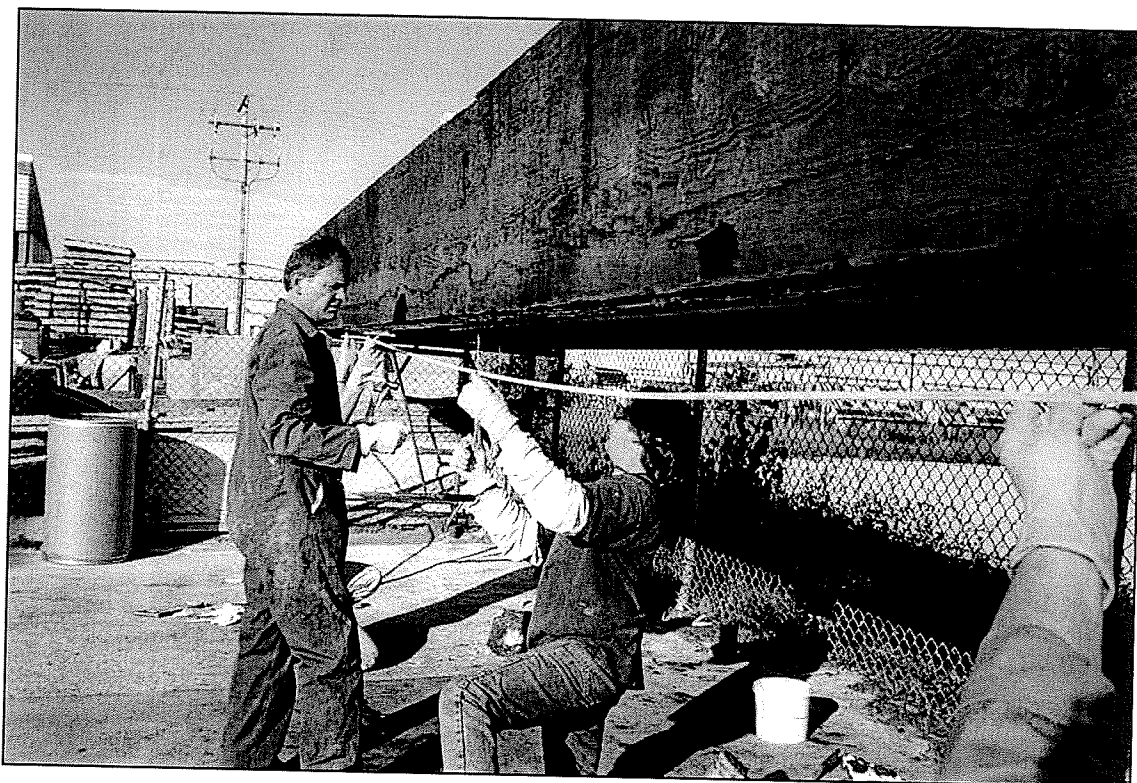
Configuration of full-scale reinforced timber beams
